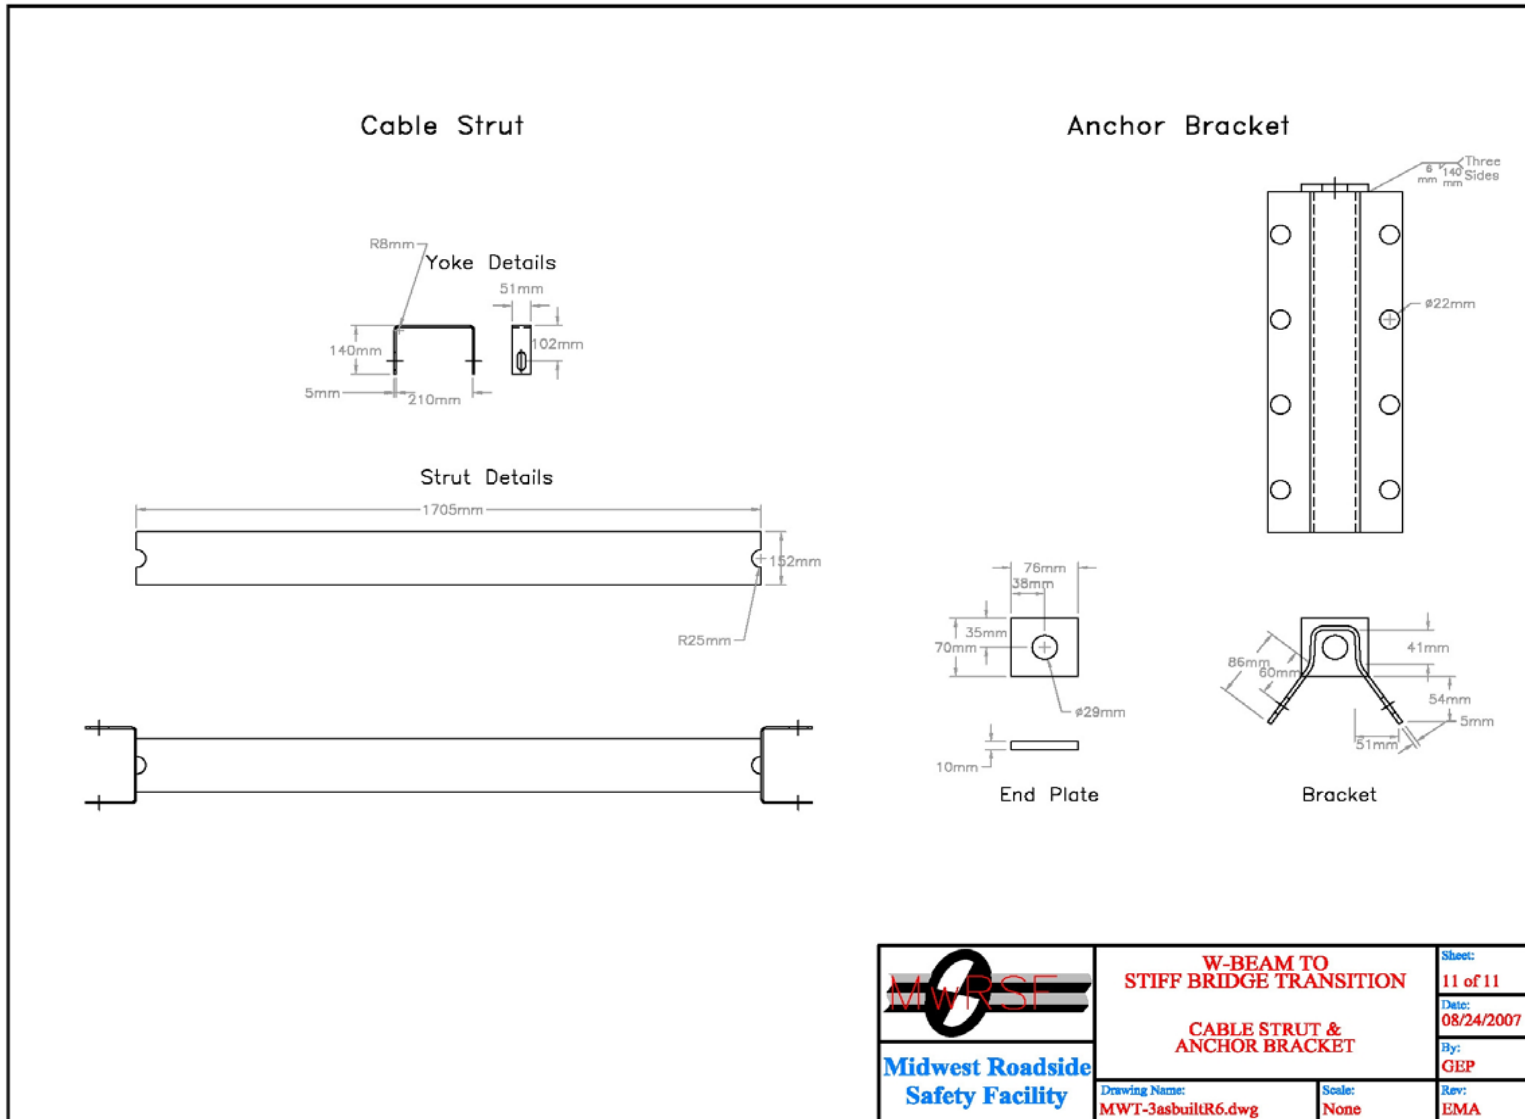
Cable Strut and Anchor Bracket Details (Design No. 1)
